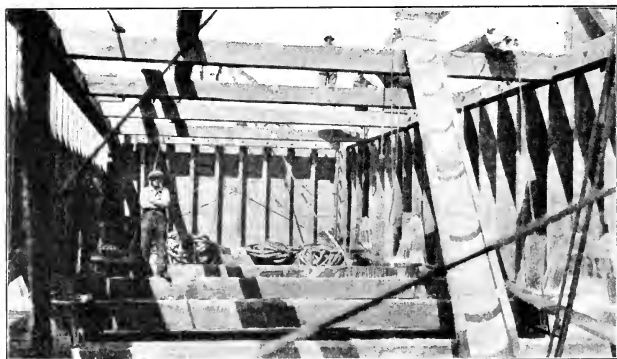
SINKING CAISSON, WATER BEING ADMITTED.
